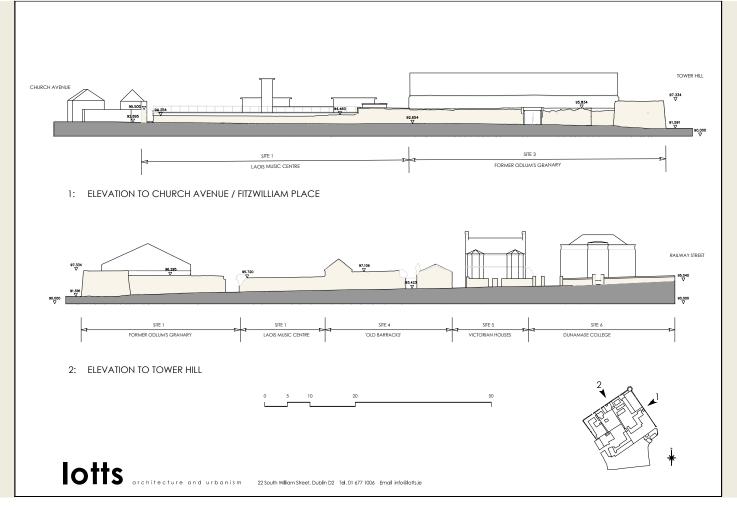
Survey drawing (elevation to Church Avenue/Fitzwilliam Place and elevation to Tower Hill)
